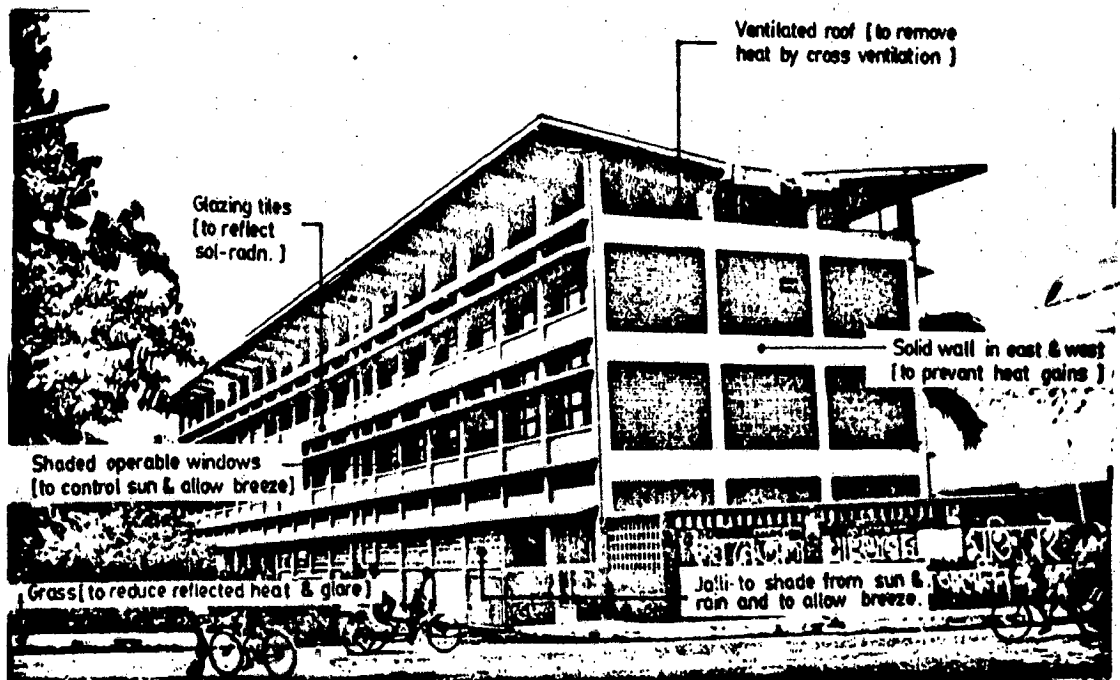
Teacher-student centre [DU], making use of shaded roof and reflecting facade with shaded windows.
